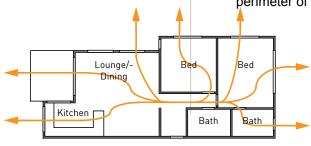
C.4-1: Building layout that facilitates cross ventilation.
